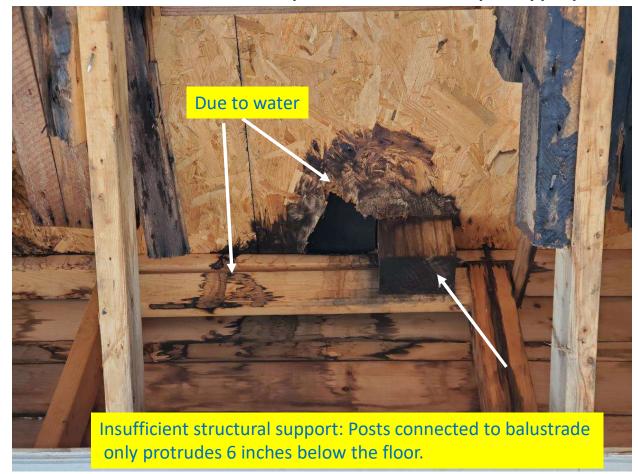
7102 Maple Ave – deteriorated post upper porch
